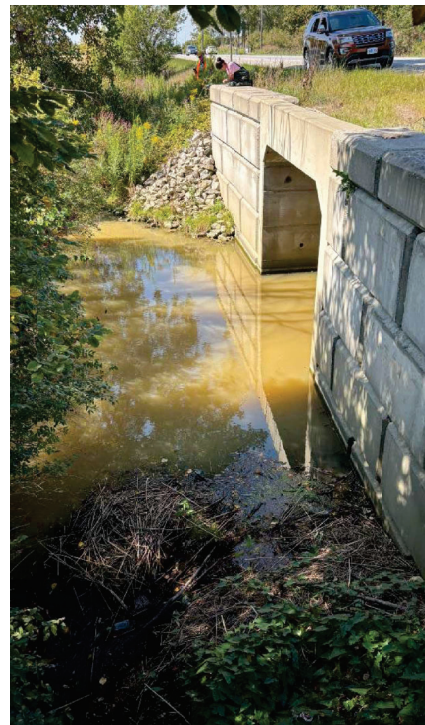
Inlet of concrete box culvert, facing west from south side of County Road 46.
